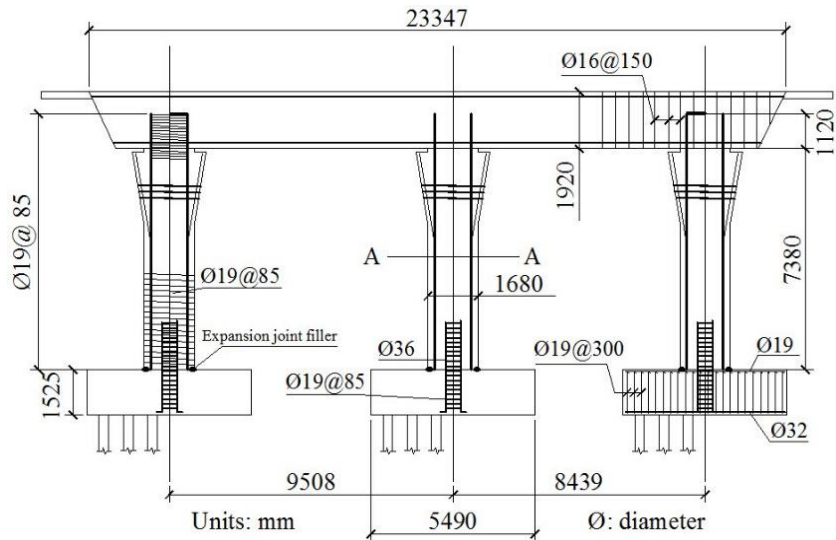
Bent design details (adapted from Caltrans, 2008)
